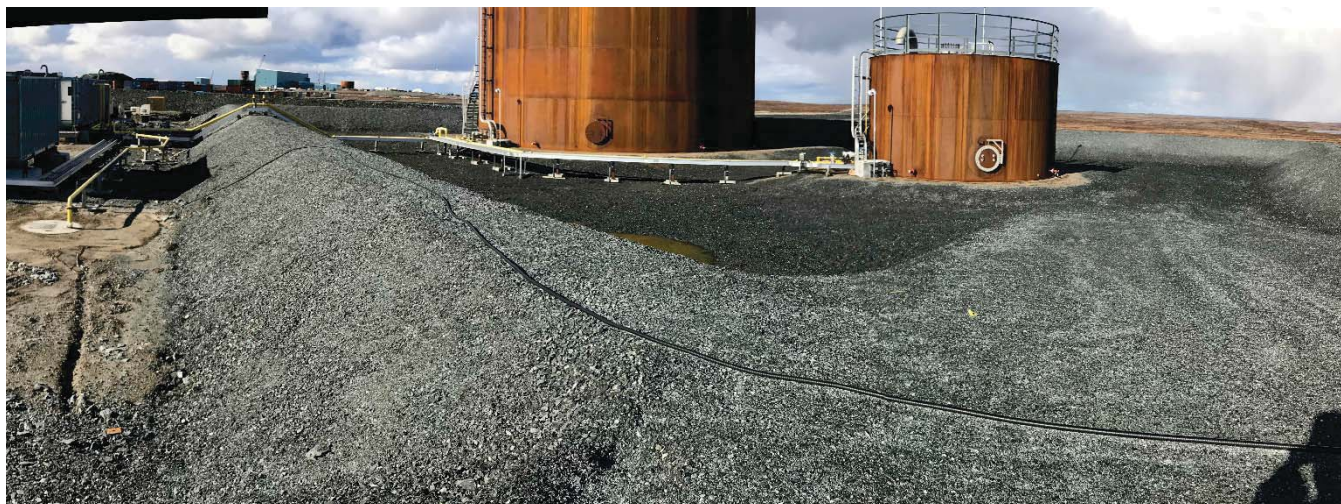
Operations Landfill Expansion, Northeast Slope from the Southeast Corner of the New Landfill Expansion. Slopes of New Expansion are Steeper than Original Landfill Slopes (13 September 2018)
